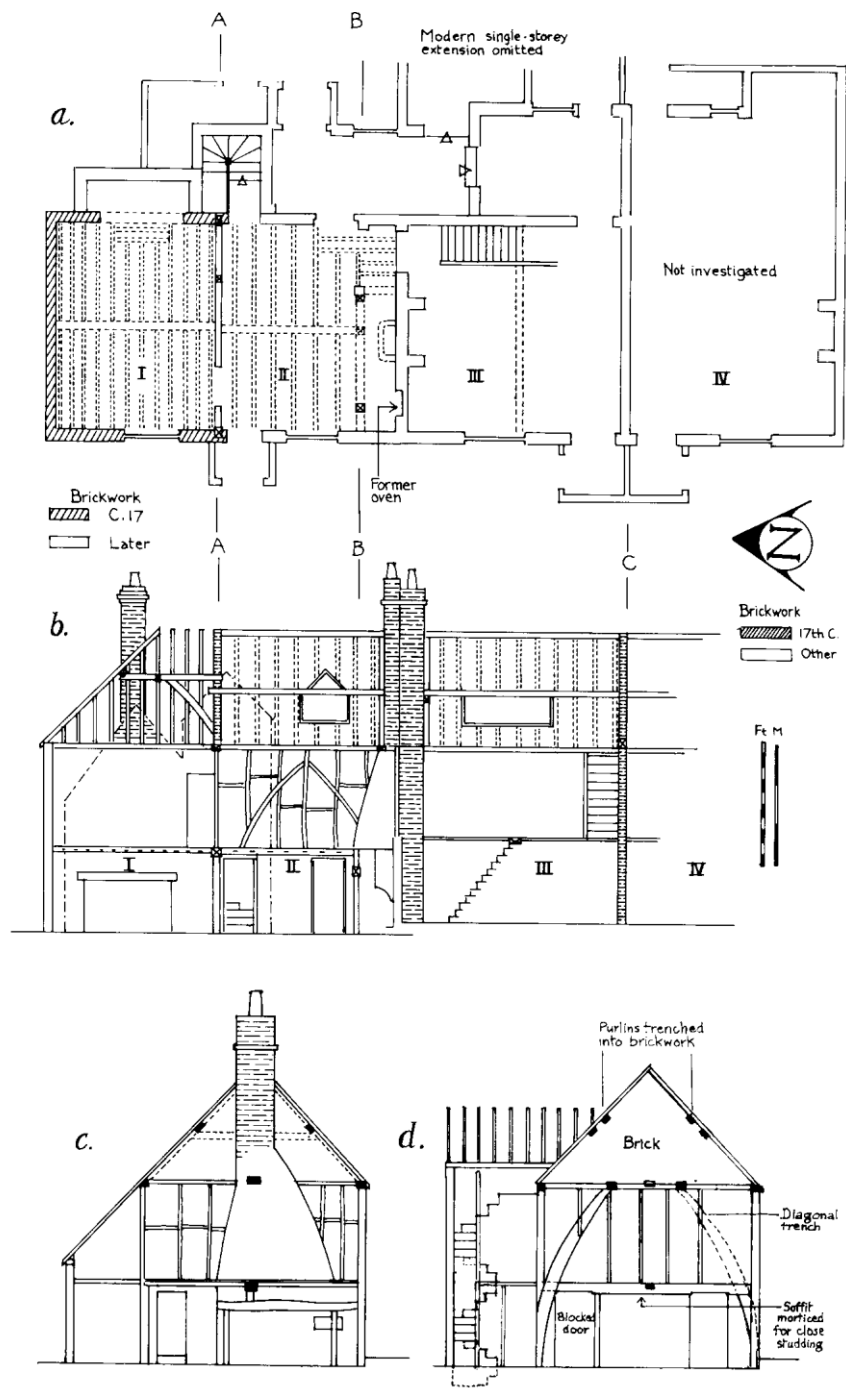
Forge House (The Fleur-de-Lys). (a) Ground plan: the earliest house is represented by Bays I and II, on the right of the plan, (b) Cut-away view, looking east, (c) Section at B-B, looking south, (d) Section at A-A looking south.
